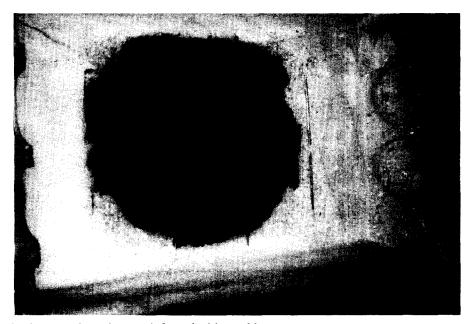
Failure under impact of specimen reinforced with steel bars.
